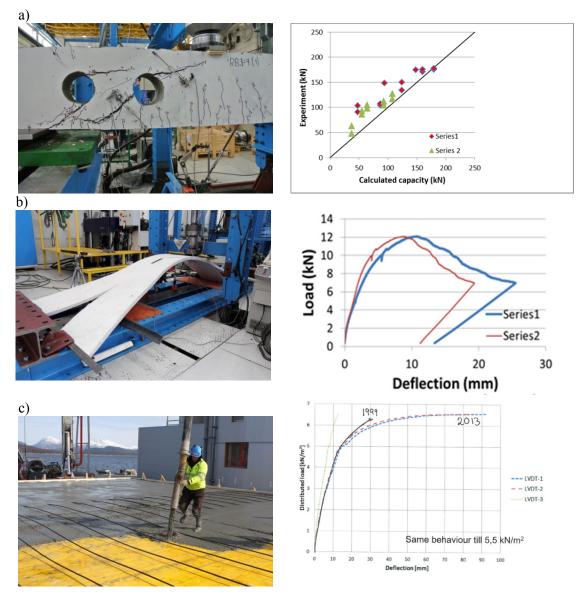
Examples of fibre reinforced concrete structures which have been tested and evaluated. (a) Beam elements with circular openings and a diagram which shows agreement between experiments and calculation models, (b) The Leonardo daVinci bridge which was made of UHPFRC in 2008, and the measured load deflection curves, (c) Casting of the post-tensioned and fibre reinforced flatslab which were tested in Spjelkavik and the measured load-deflection curve.
